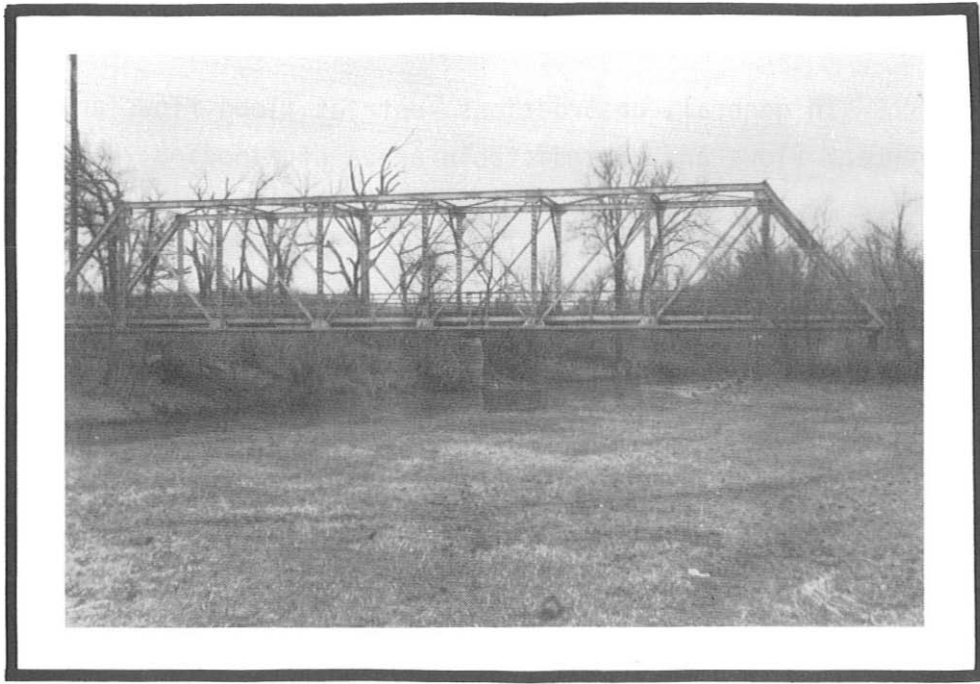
Skunk River - county road bridge at northeast corner of Section 13, T84N-R24W, looking downstream, Mile 8.02.
